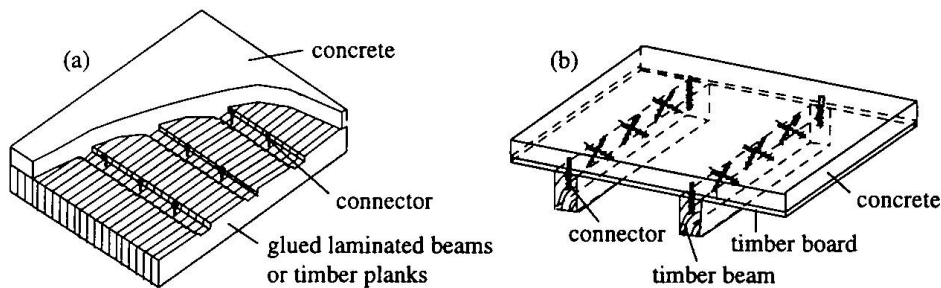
Design of timber-concrete composite floors: slab type floor (a) made of glued laminated beams with the longer side of their cross-section horizontal or nailed laminated wood of sawn timber planks and beam type floor (b) with glued laminated or sawn sections
